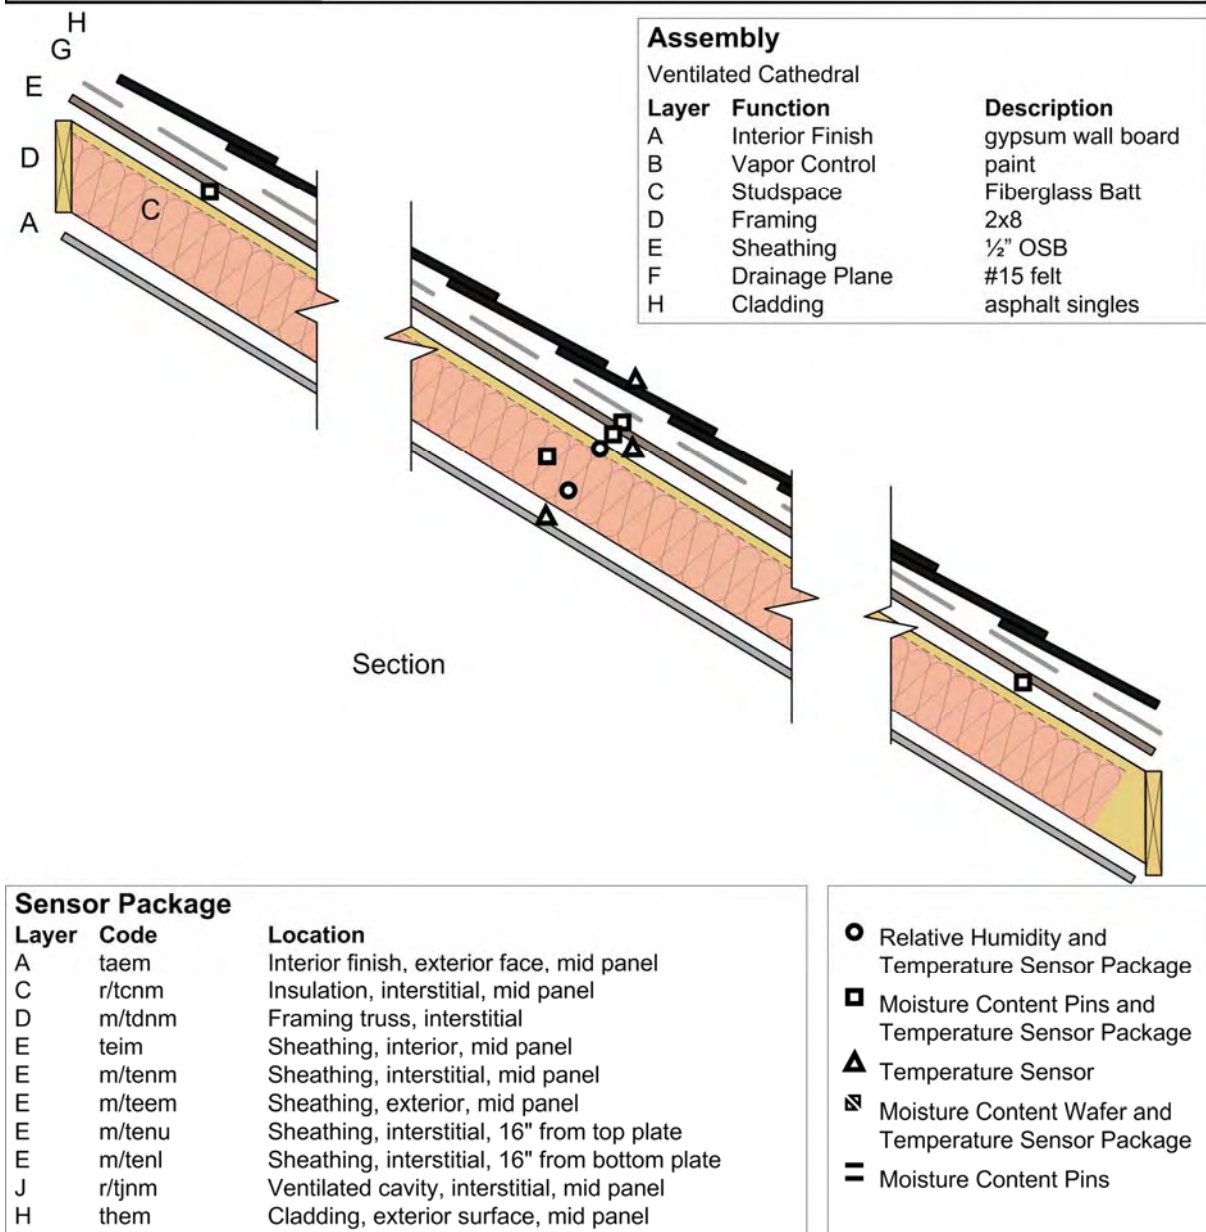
Atlanta Roof 6: Ventilated Cathedral Ceiling, construction and sensor layout
